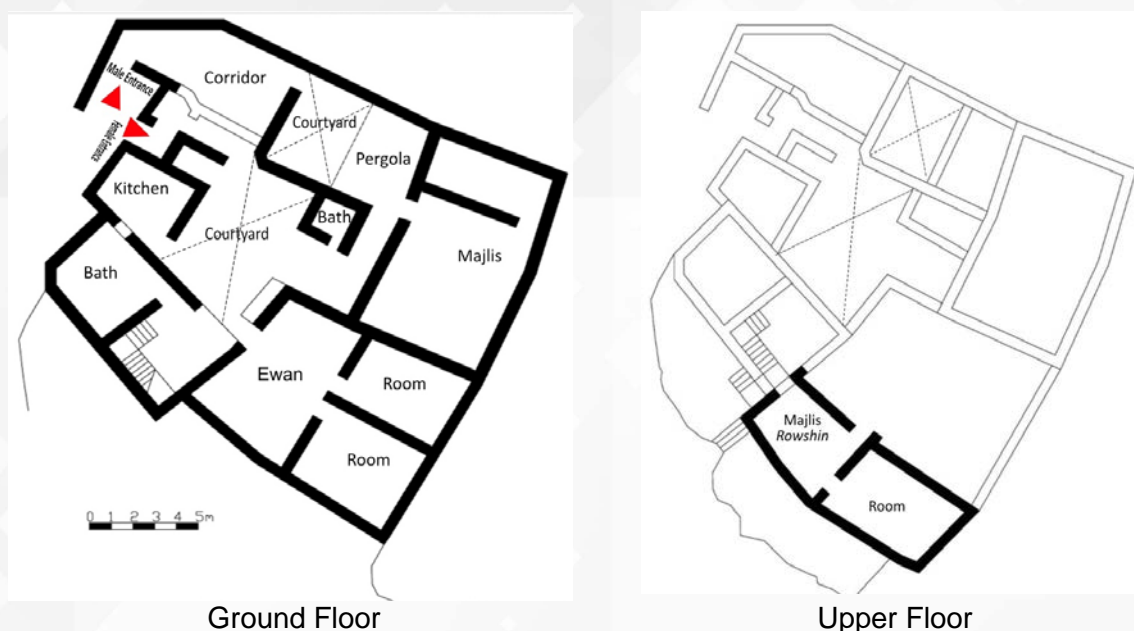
Ground and upper floor plans of al-Nassar House, below Marid Castle as an example of al-Dar'i houses (Source: Author)
